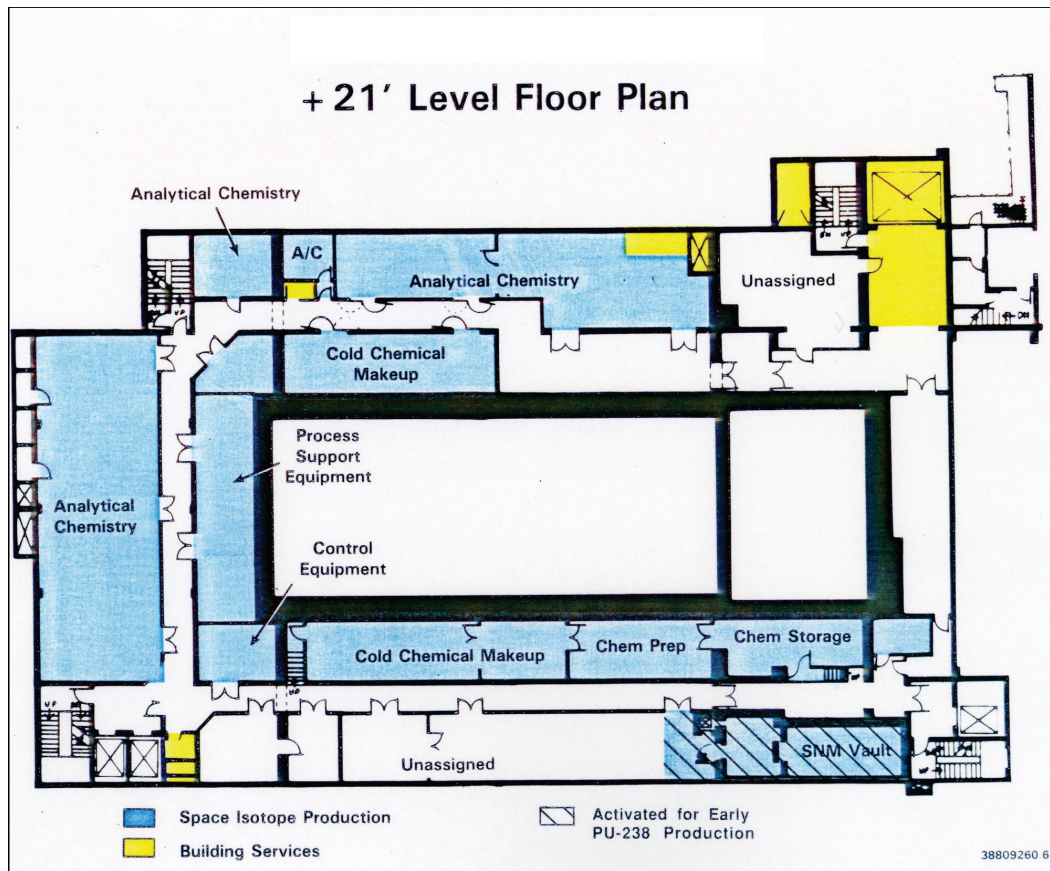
FMEF Process Building, 21 Foot Level Floor Plan. Note: Floor plan as laid out for the Radioisotope Thermal Generator Mission
